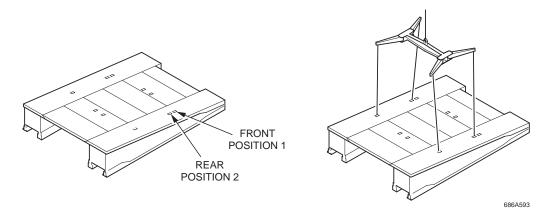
41 Bridge Module Lifter Connected to Ramp Module in POSITION 2
